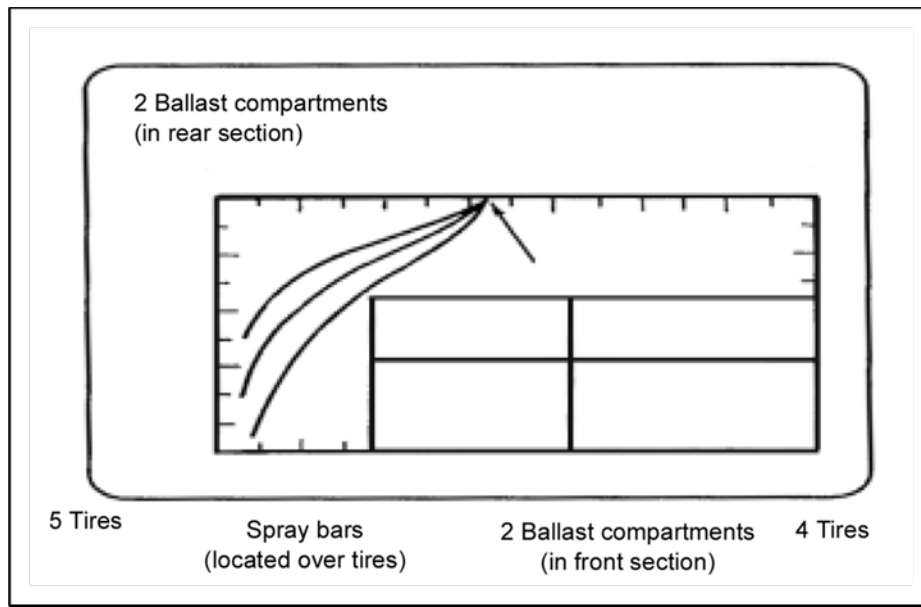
Self-propelled, nine-wheel, pneumatic-tired roller
